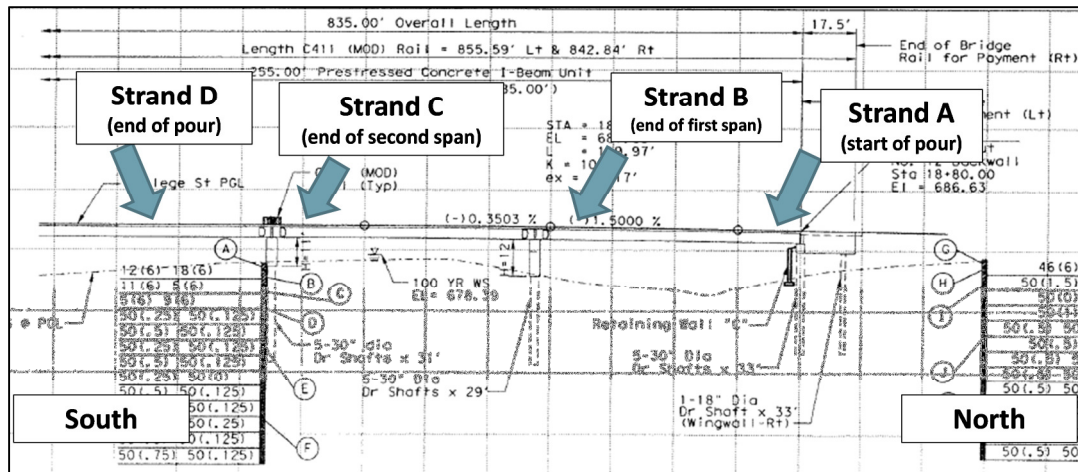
iButton strand layout for Georgetown bridge deck winter pour.
